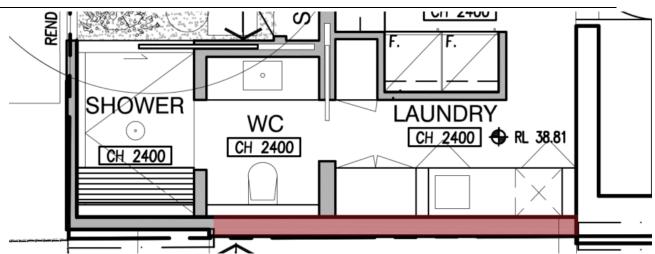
Proposed ground floor plan showing the extent of the proposed southern boundary wall, constructed within title boundary (highlighted in red)
